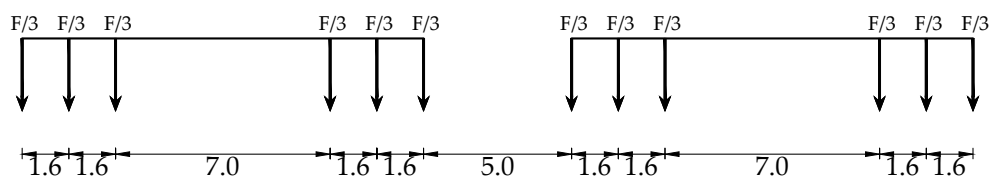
Train 3 dimensions and loads. Dimensions in m.
